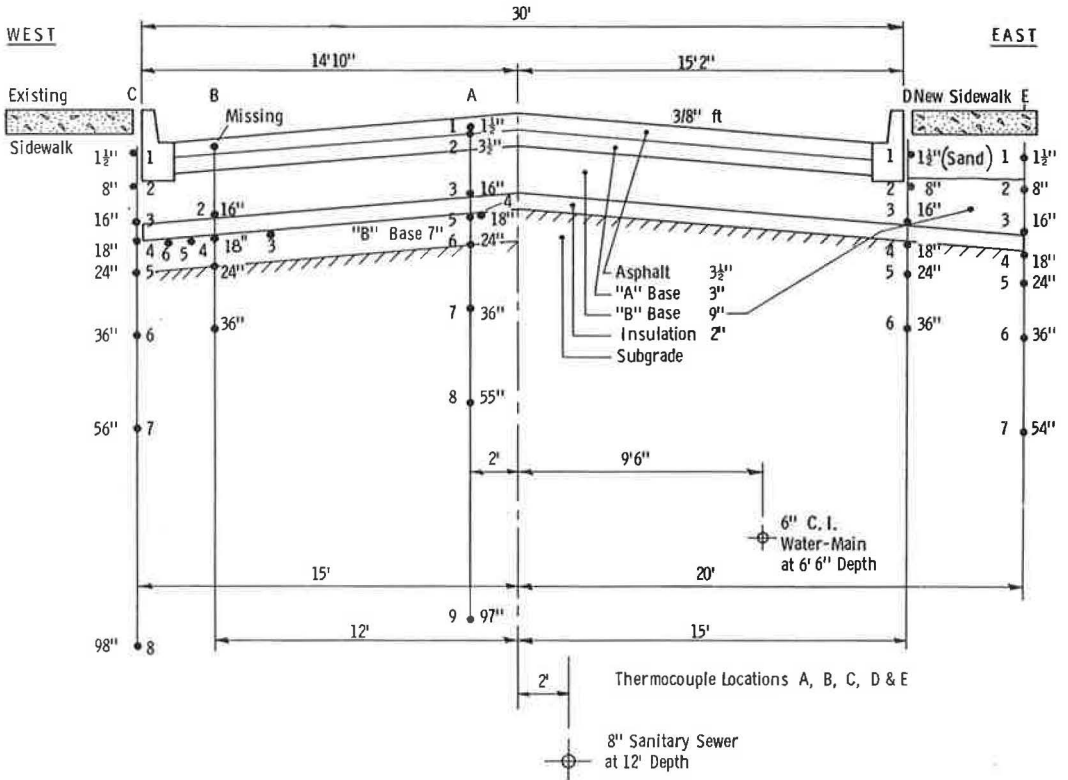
Pavement design and thermocouple locations of insulated section at Station 5+41, Antwerp Street.
